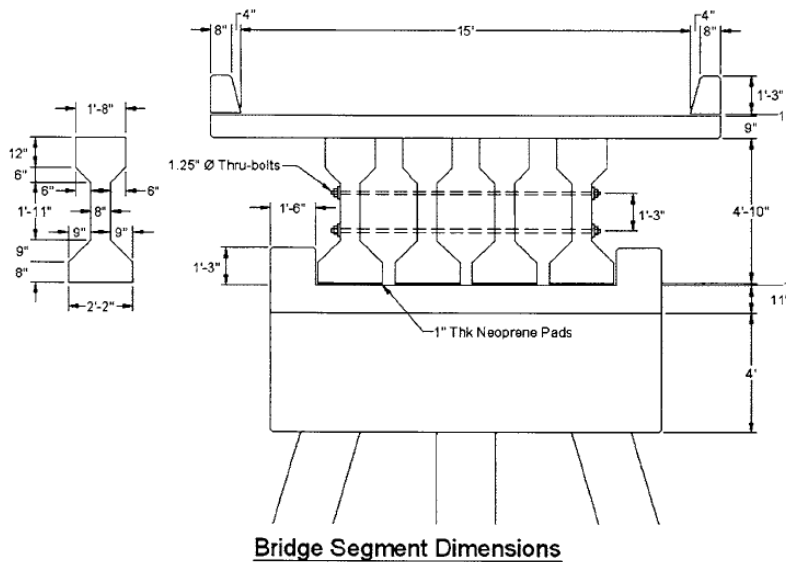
Cross-section details of Railroad Bridge over Biloxi Bay (Gilberto et al., 2007).
